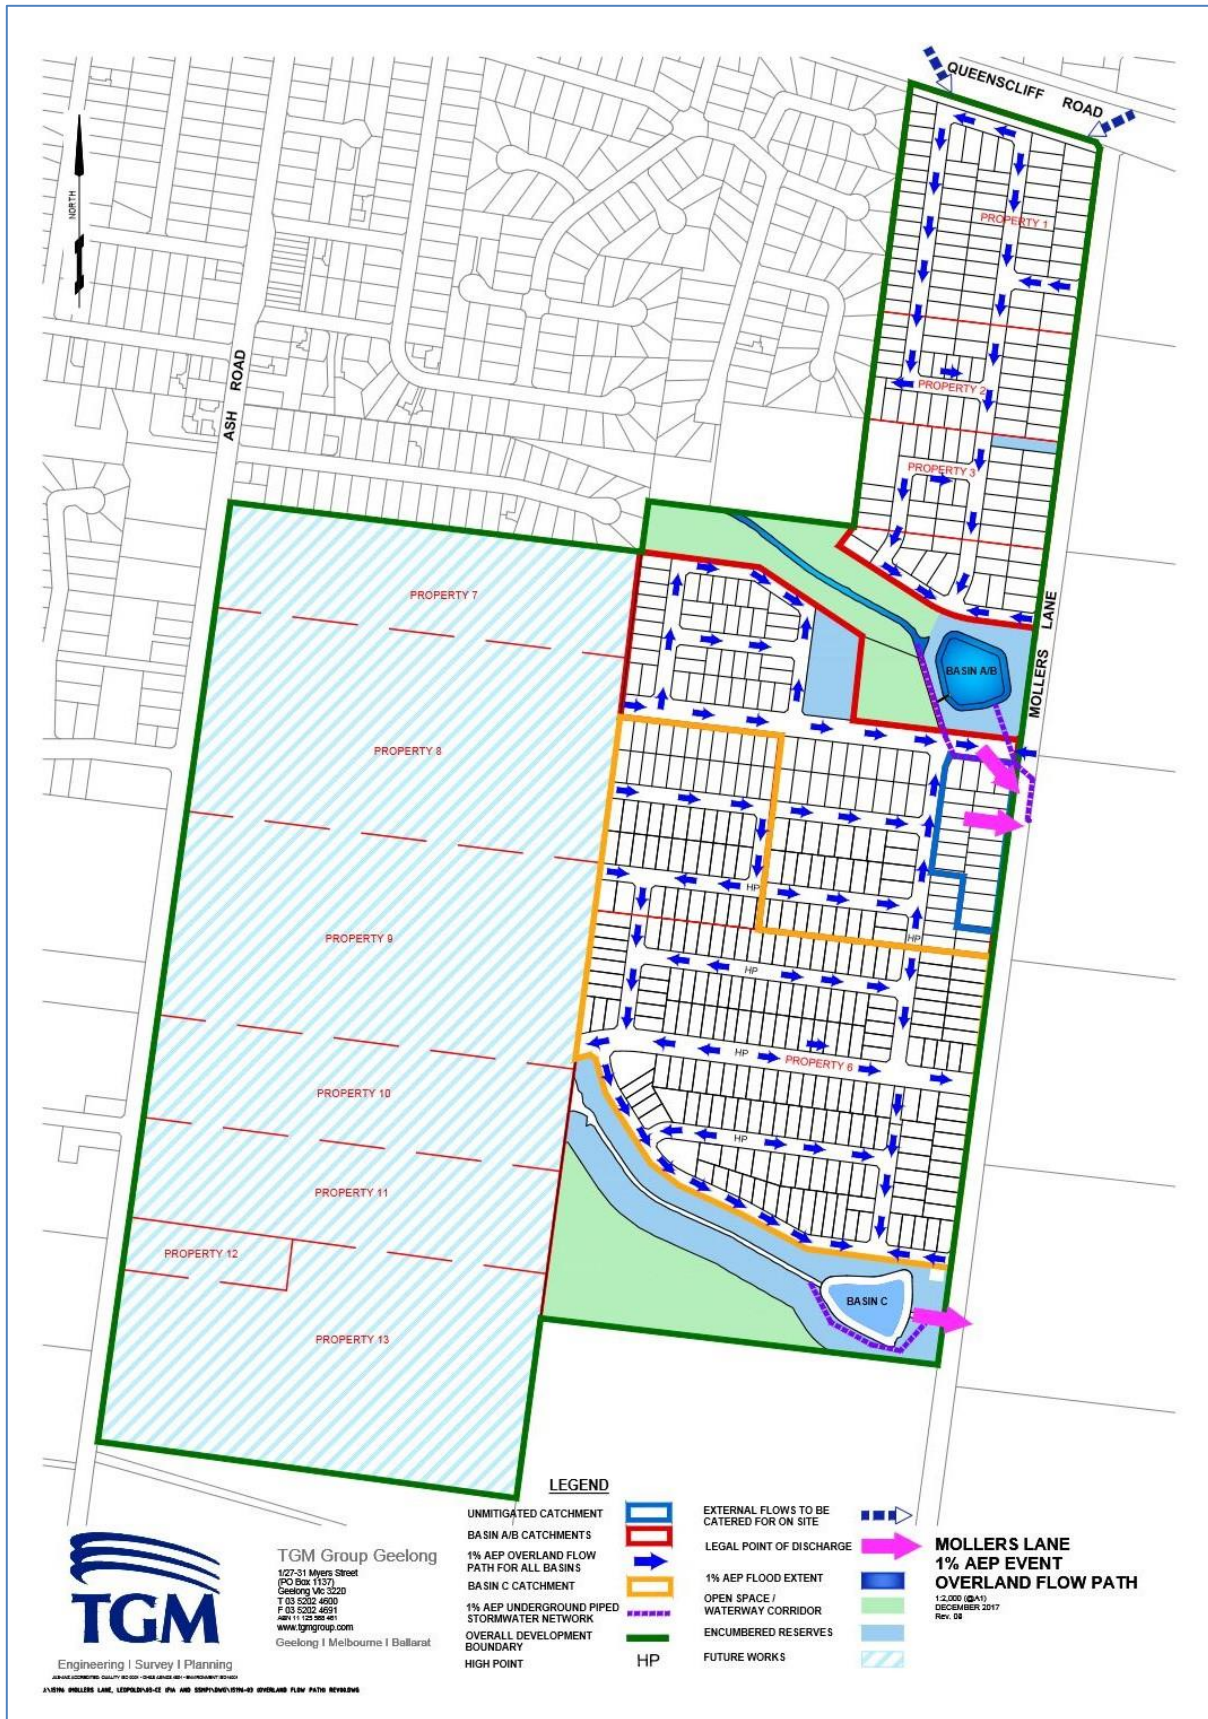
Concept Plan – Drainage Reserve Detention Basin and Wetland
